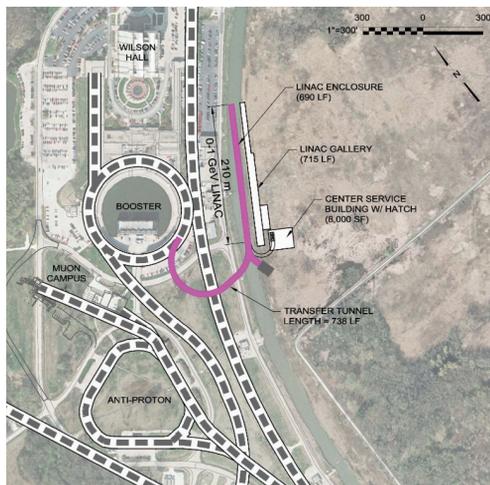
Site layout of PIP-II. New construction is predominantly in the Tevatron infield. Grey dashed areas represent existing underground enclosures.
